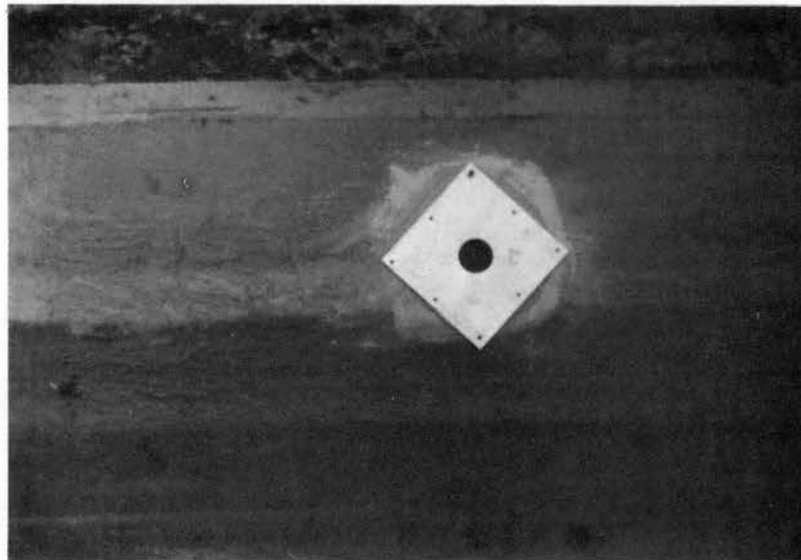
A Plate Installed with Adhesive and Concrete Nail.
